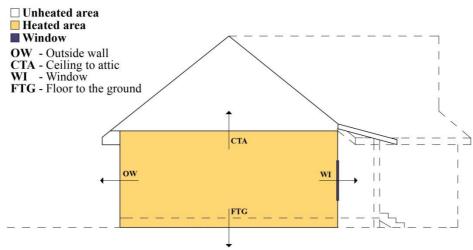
Building elements shown by location in the straw-bale building and in the virtual brick building
